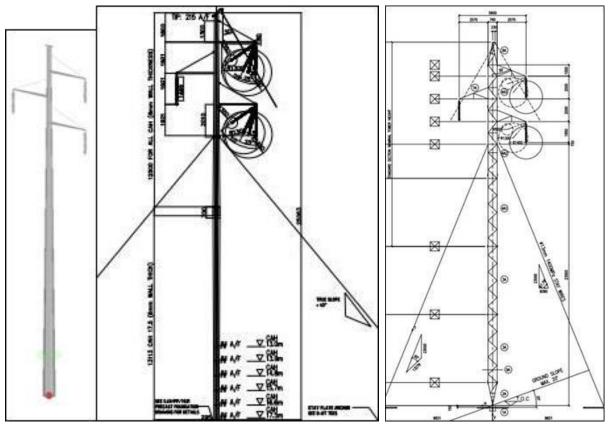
Typical monopole (left) and lattice (right) tower structure.
